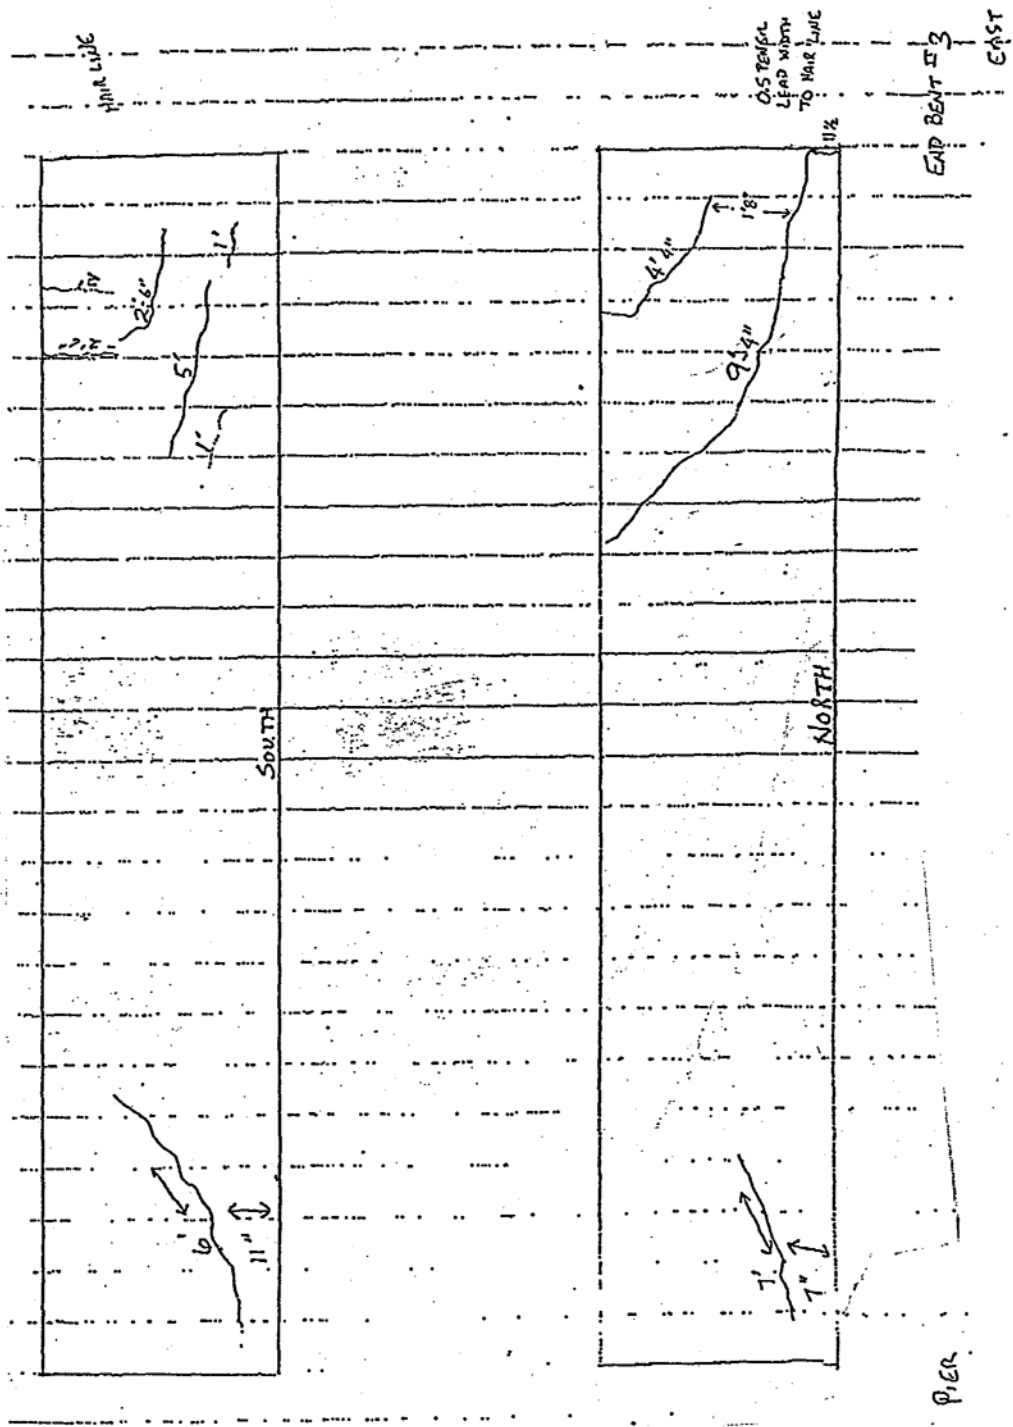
Crack of North Exterior Girder over I-75 NB
